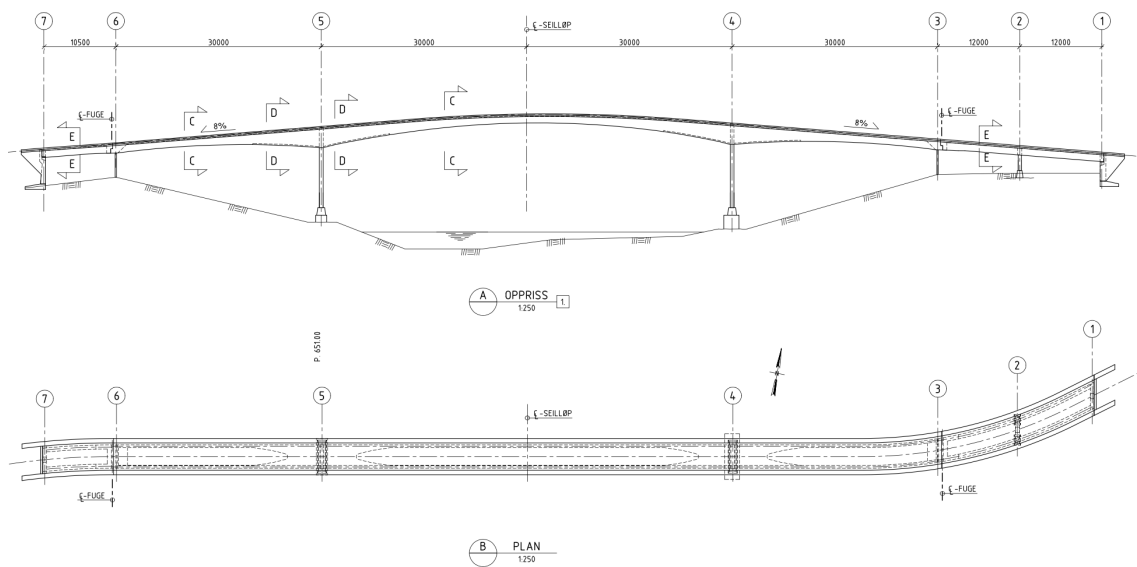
Side elevation and plan drawing of Herøysund Bridge.
